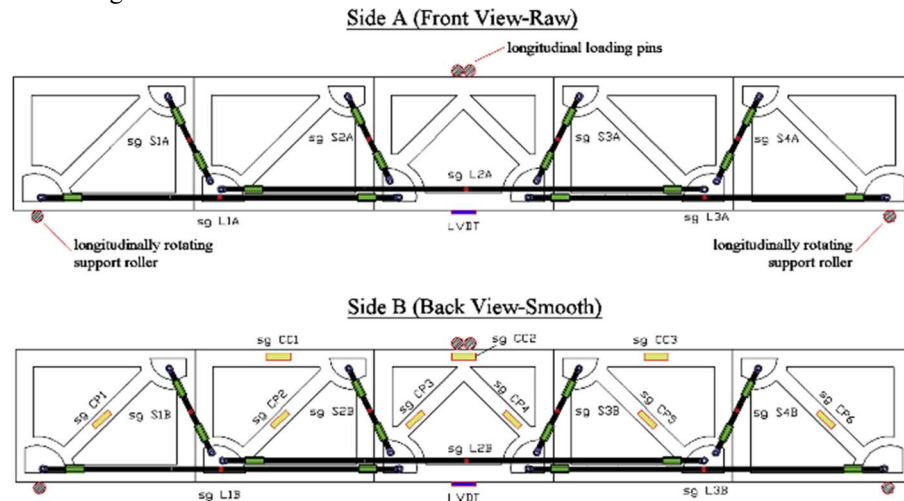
Front view and back view of the straight beam with strain measurement devices [42]
